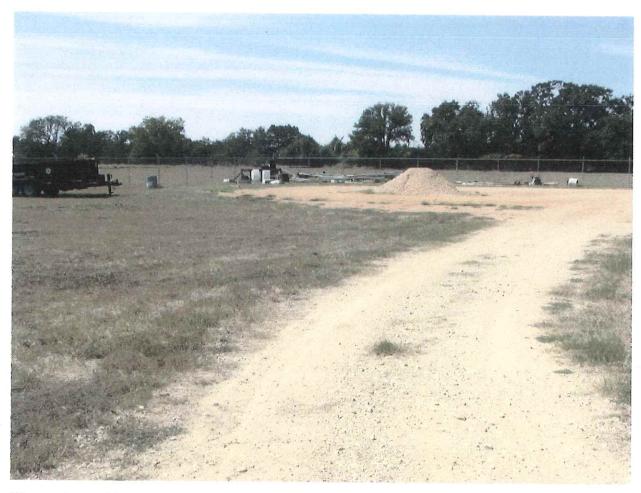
Looking North at WWTP, Chlorination Building, and Operations Barn (11-12-15).
